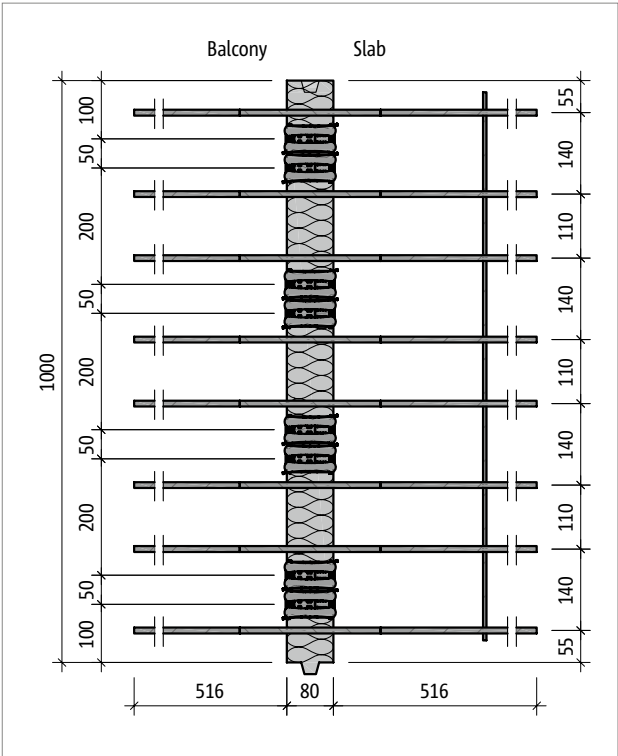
Schöck Isokorb® T type Q-E-V5: Product layout
